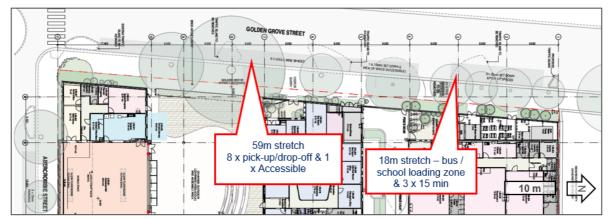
| Site layout showing parking details for Golden Grove Street (Source: Applicant's EIS 2020)
